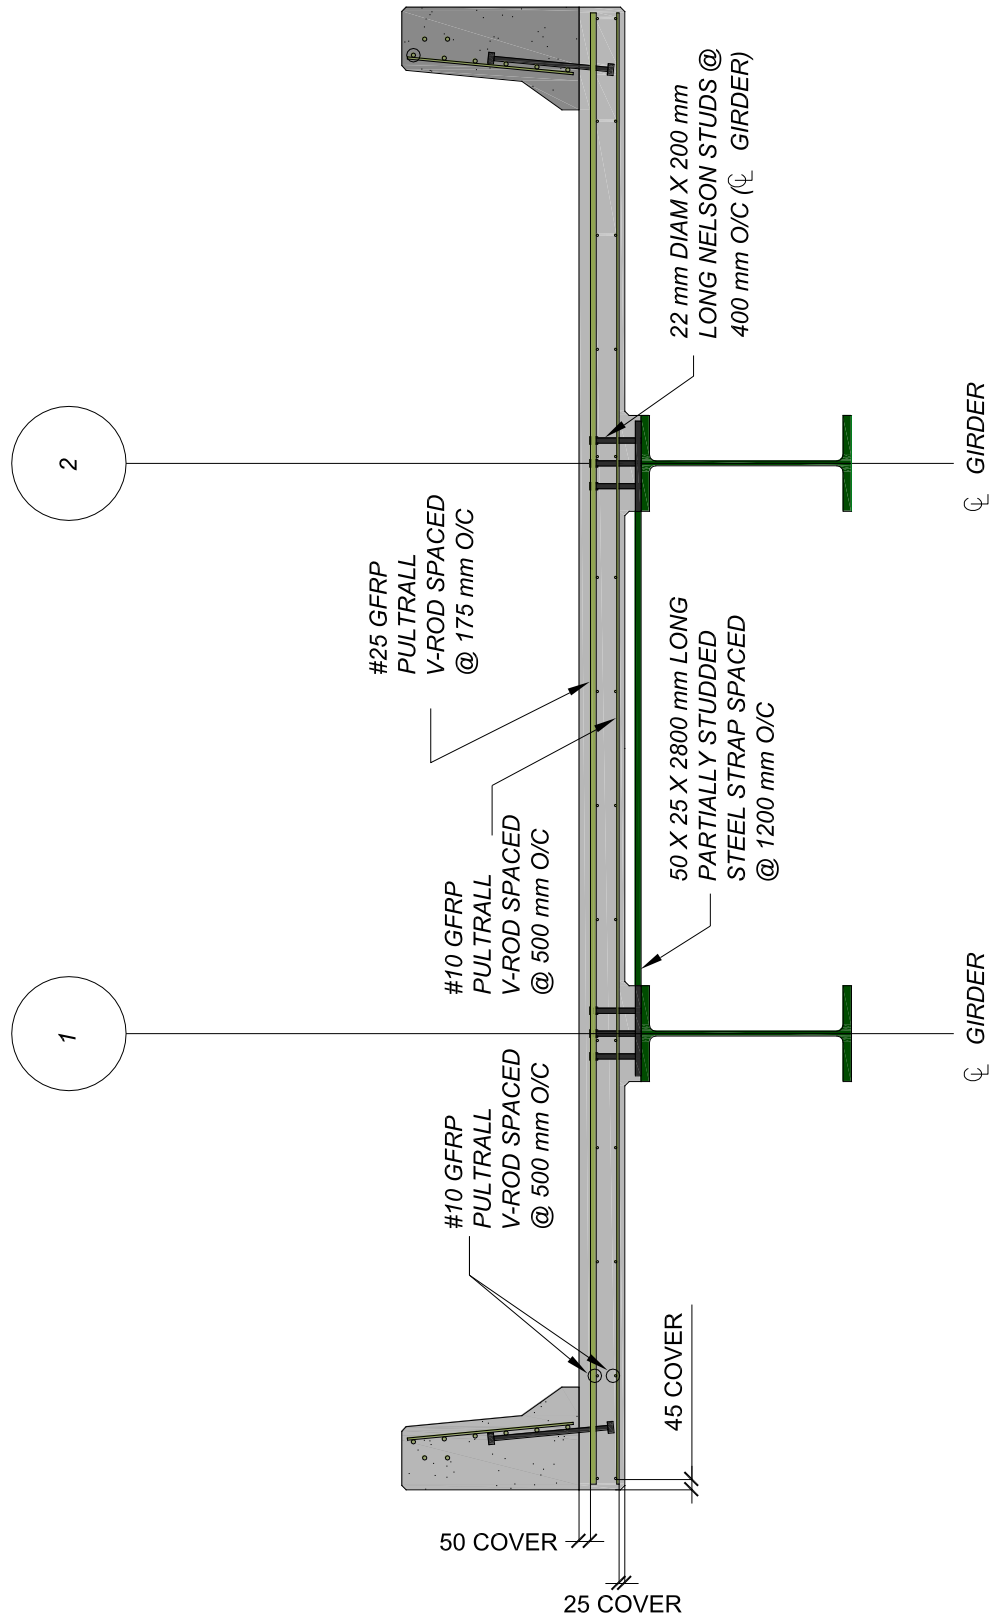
Cross section view of Segment B: Steel-free reinforced concrete bridge deck slab
